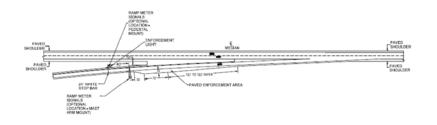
Freeway to Freeway Ramp Meter Signing and Pavement Markings
